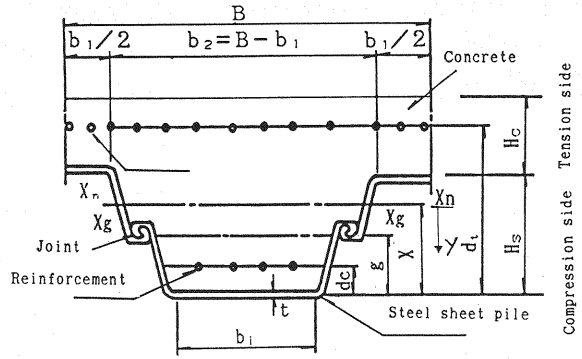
Cross Section of a Covered Steel Sheet Pile.
